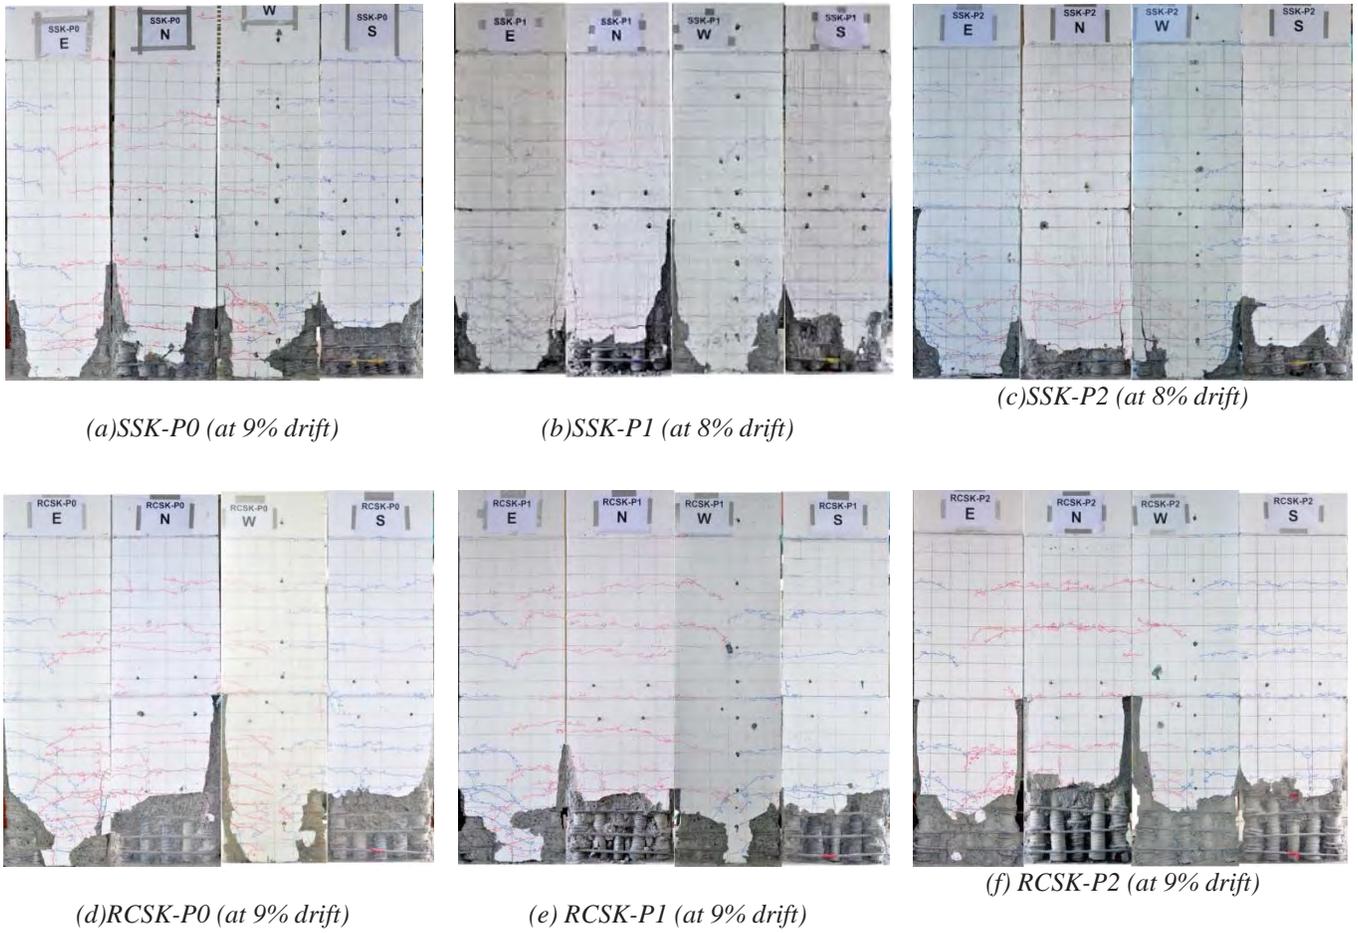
Photographs of the precast segmental column specimens after cyclic loading tests
